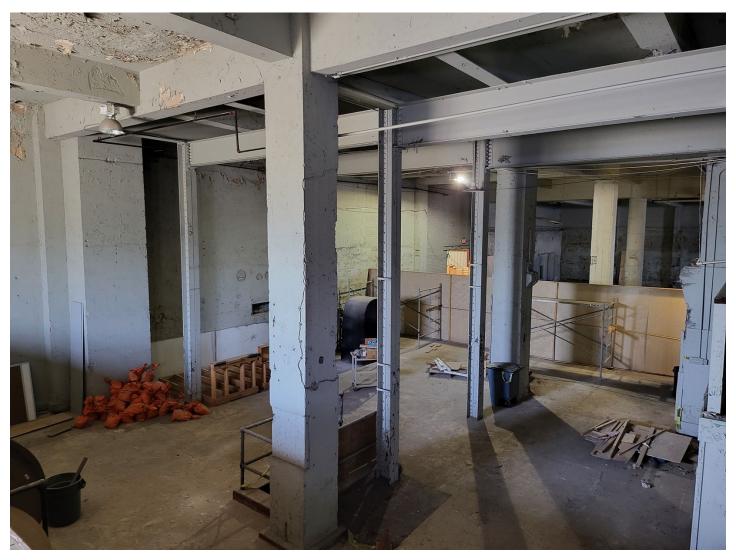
First floor refrigeration room with boiler room stair at left. Facing east toward primary elevation.
